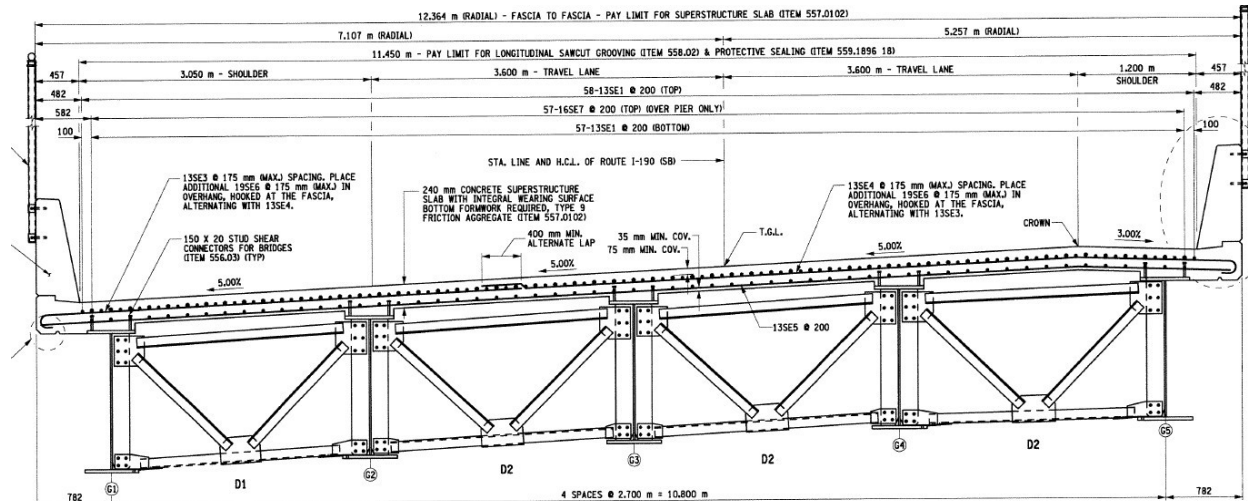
Section View of I-190 over CSX Railroad (Southbound)
